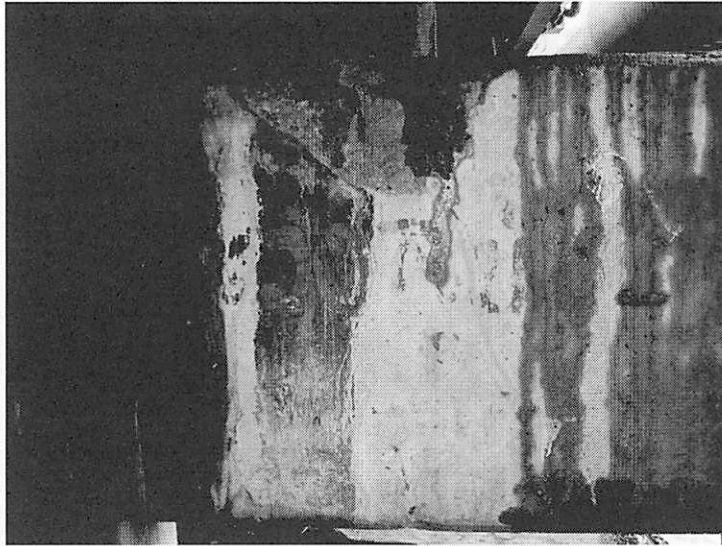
shows the corrosion of reinforcing bar in tie-beam. It should be noticed that the corrosion takes place more severely in upper rebar. The beam shown in Figure 65 is extensively found. However, the plantation is expected not to have serious effect on the strength or durability. Figure 66 is another typical damage which can be observed in the canal which has been used as transportation route as well. The splashing water from traveling boat speeds up the erosion of concrete surface.
